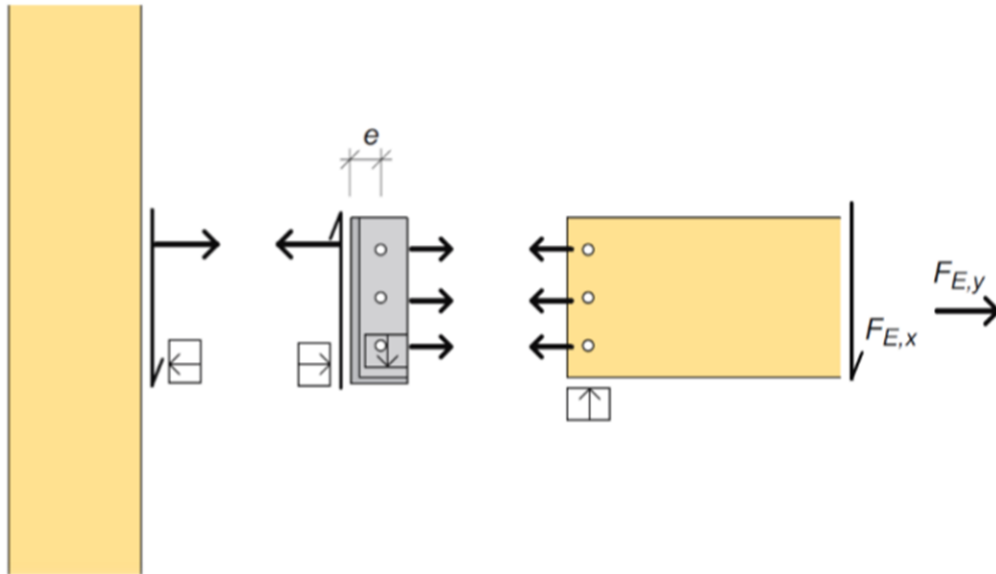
Welded beam shoe with internal plates and position of compressive and tensile forces. [2]
